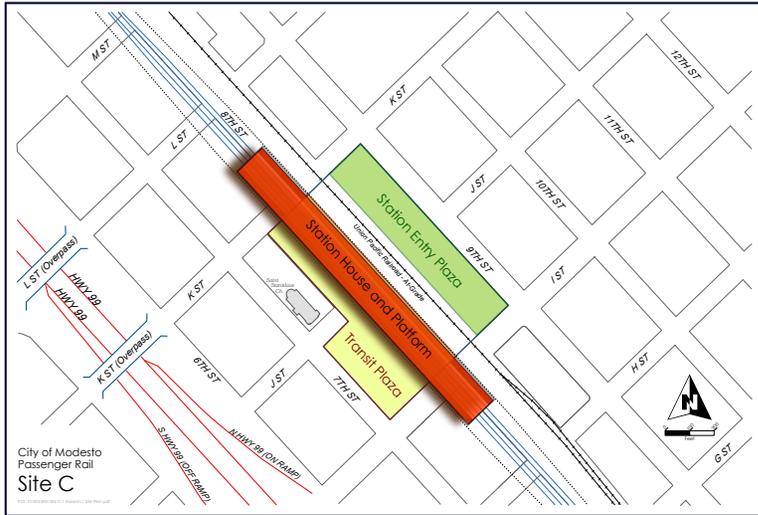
Conceptual Site Plan, Above-Grade Passenger Rail Service, Lower Level Plazas
